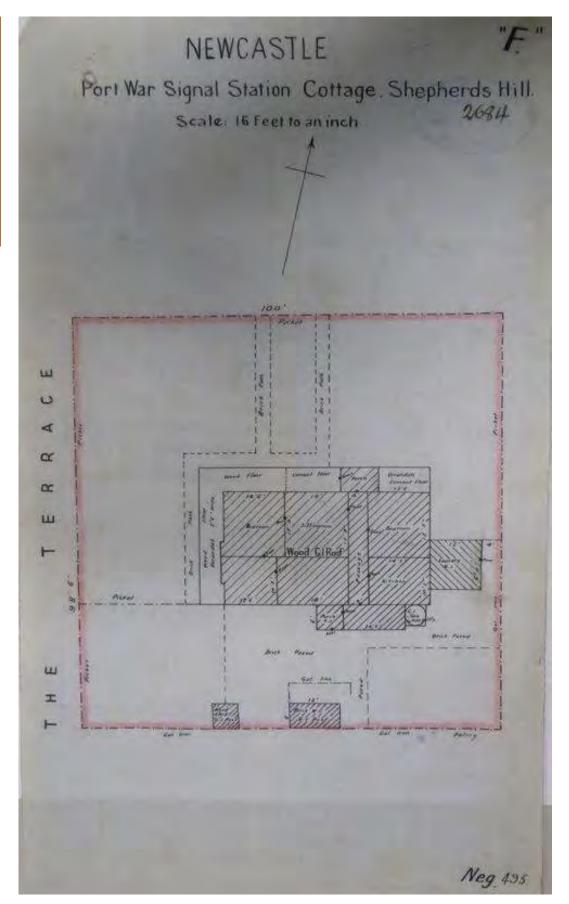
Layout plan of the cottage about September 1920. (Source: NAA, SP394/1, NL23/2684, Neg 495)
